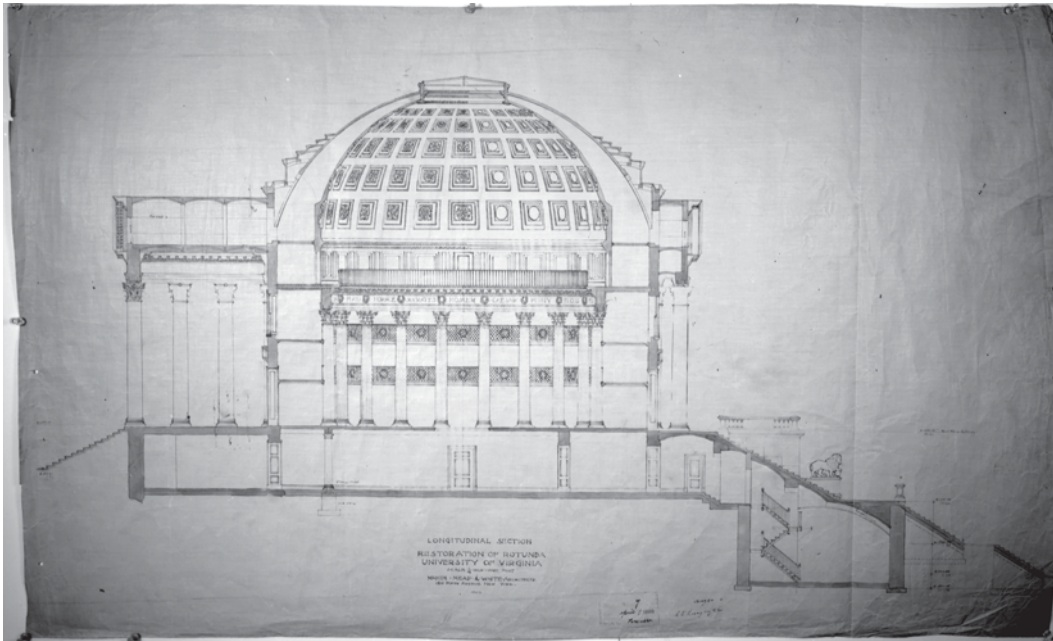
McKim Mead & White section, looking west. [Special Collections, UVA]
